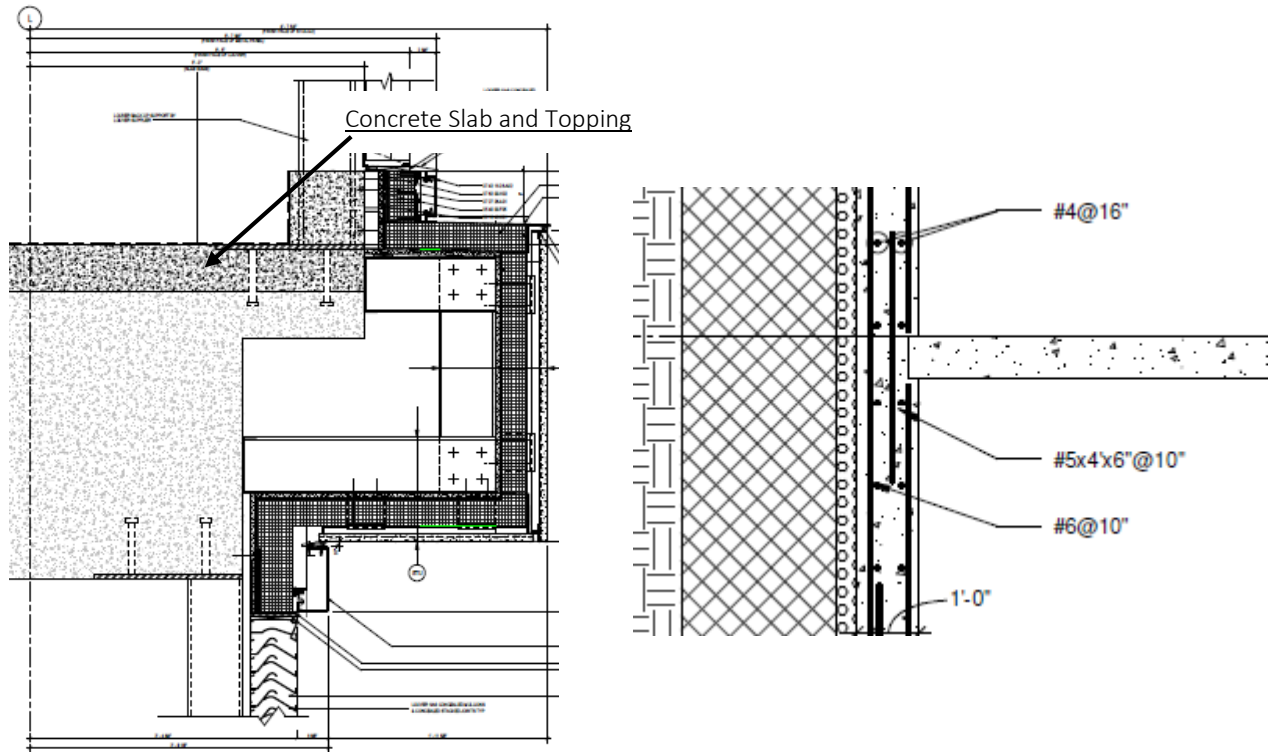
| Floor Section in Bed Tower (left, SmithGroupJJR) and Parking Garage (right, Walter P. Moore)
